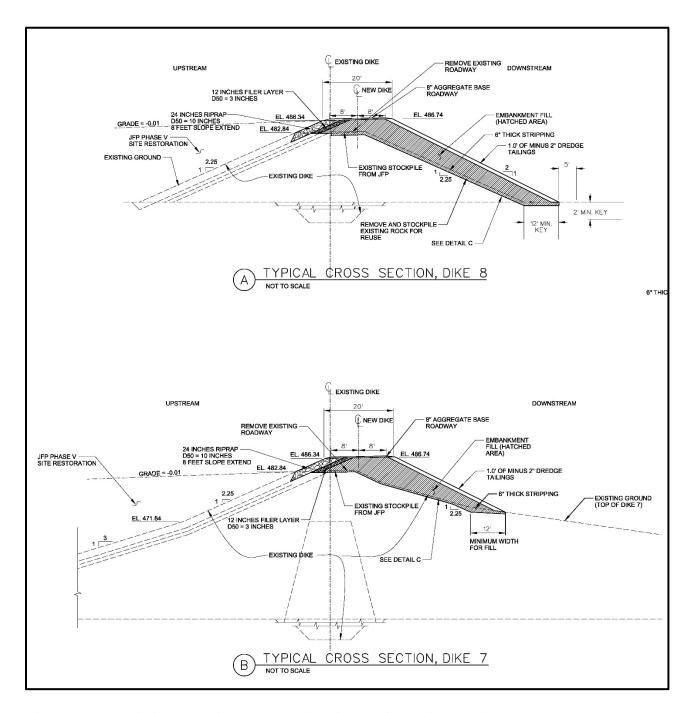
Preliminary typical cross section for 3.5-foot raise at Dikes 7 and 8.
